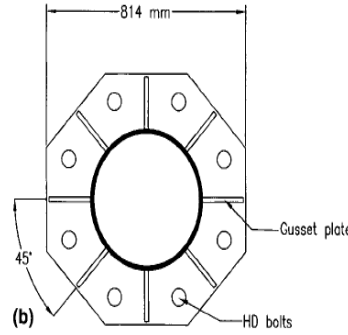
Plan of gusset stiffened socket connection (Gilani and Whittaker, 2000a)
